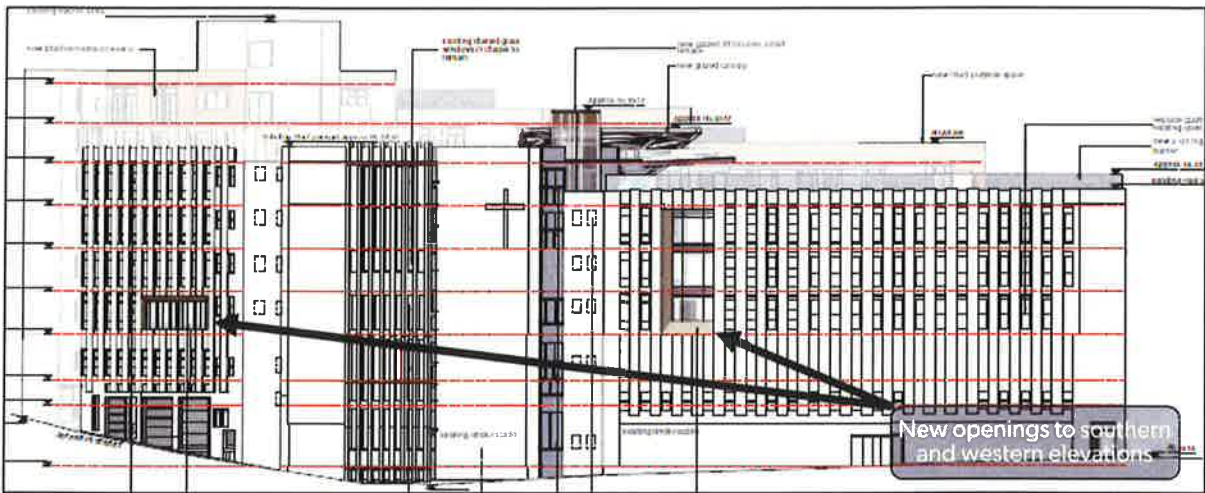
| Main Campus – Proposed Southern Elevation (Source: Applicant’s EIS 2018)
